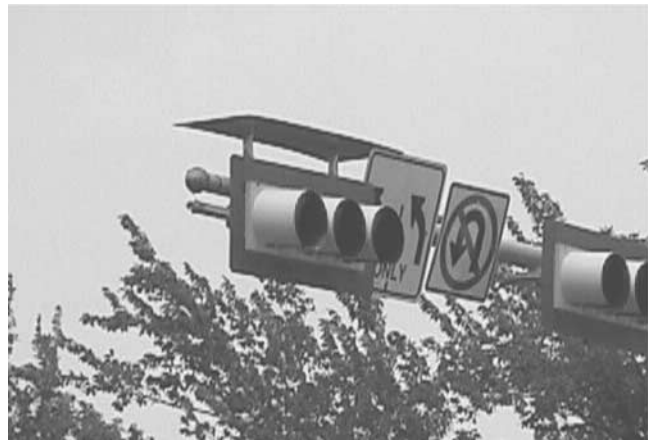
Damping plate properly installed on Dallas signal structure.
